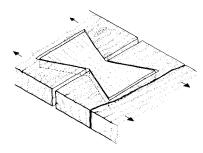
Drawing of X-shaped wooden cleat used to connect adjacent boards, mainly in later restoration works.
